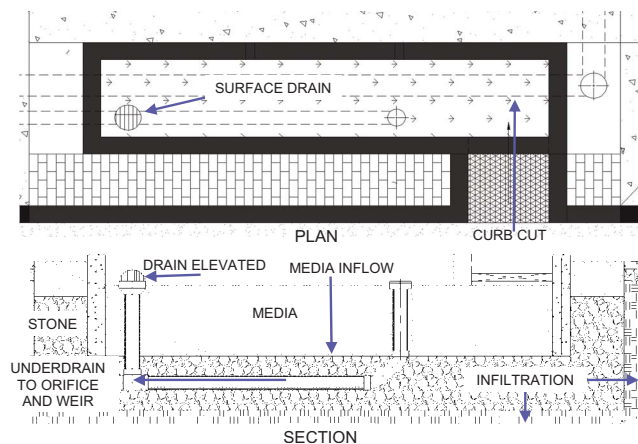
Layout and elevation view of typical planter system (courtesy of CDM and PWD)
